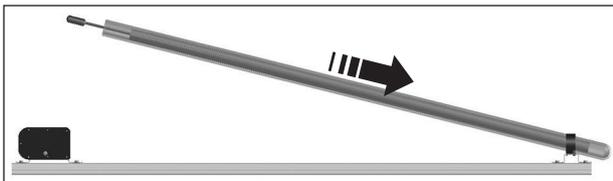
Vacuum tube with heat pipe (as supplied)
